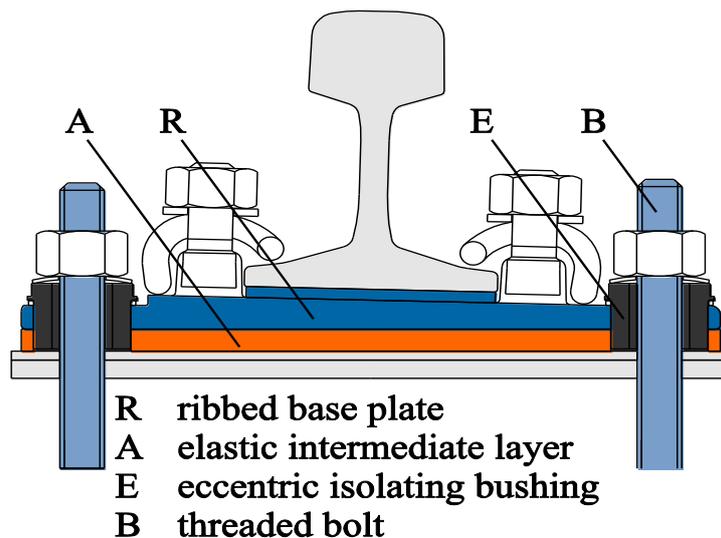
Structure rail support point ECF [ThyssenKrupp 2006]
